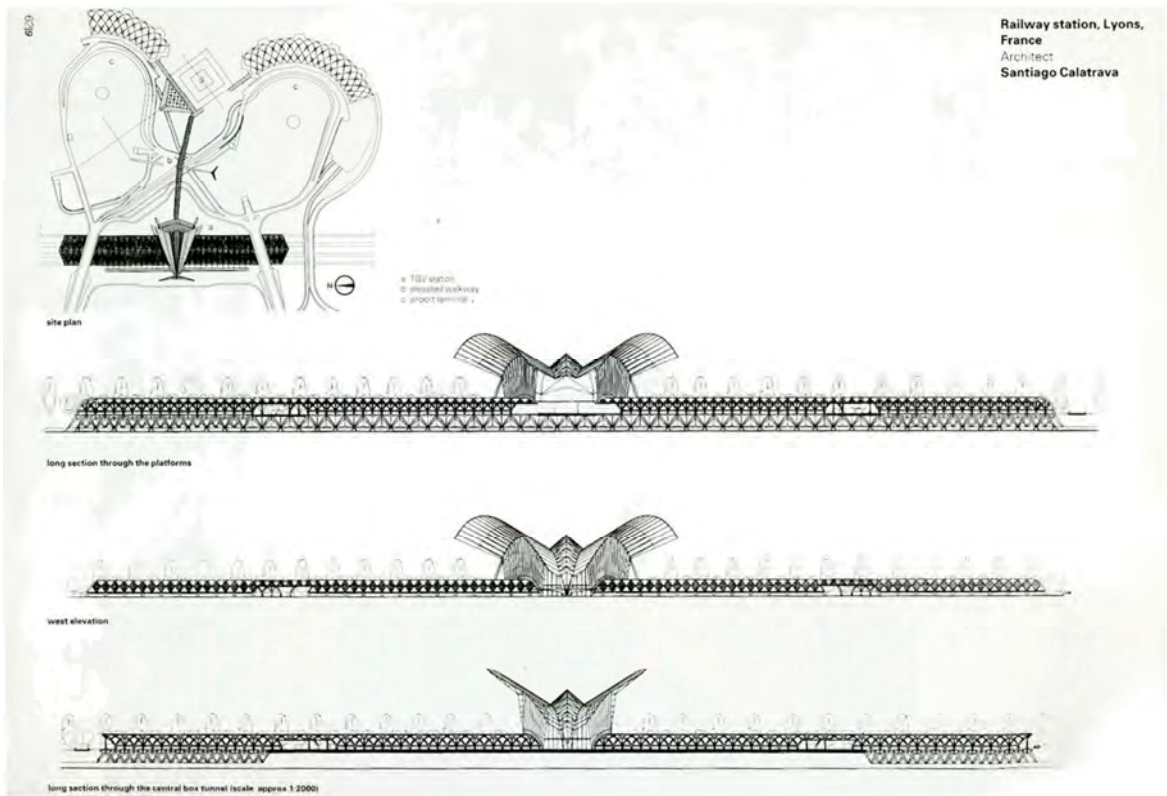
Drawings from bottom: Central Section, West Elevation, Platform Section and Plans levels (un-referenced)
